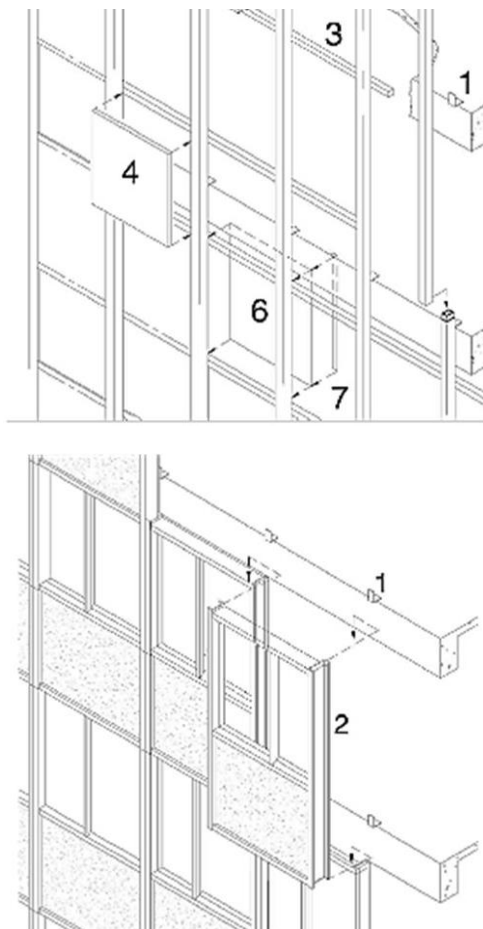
Stick curtain wall system and unitized curtain wall system, source: [CHR16]
